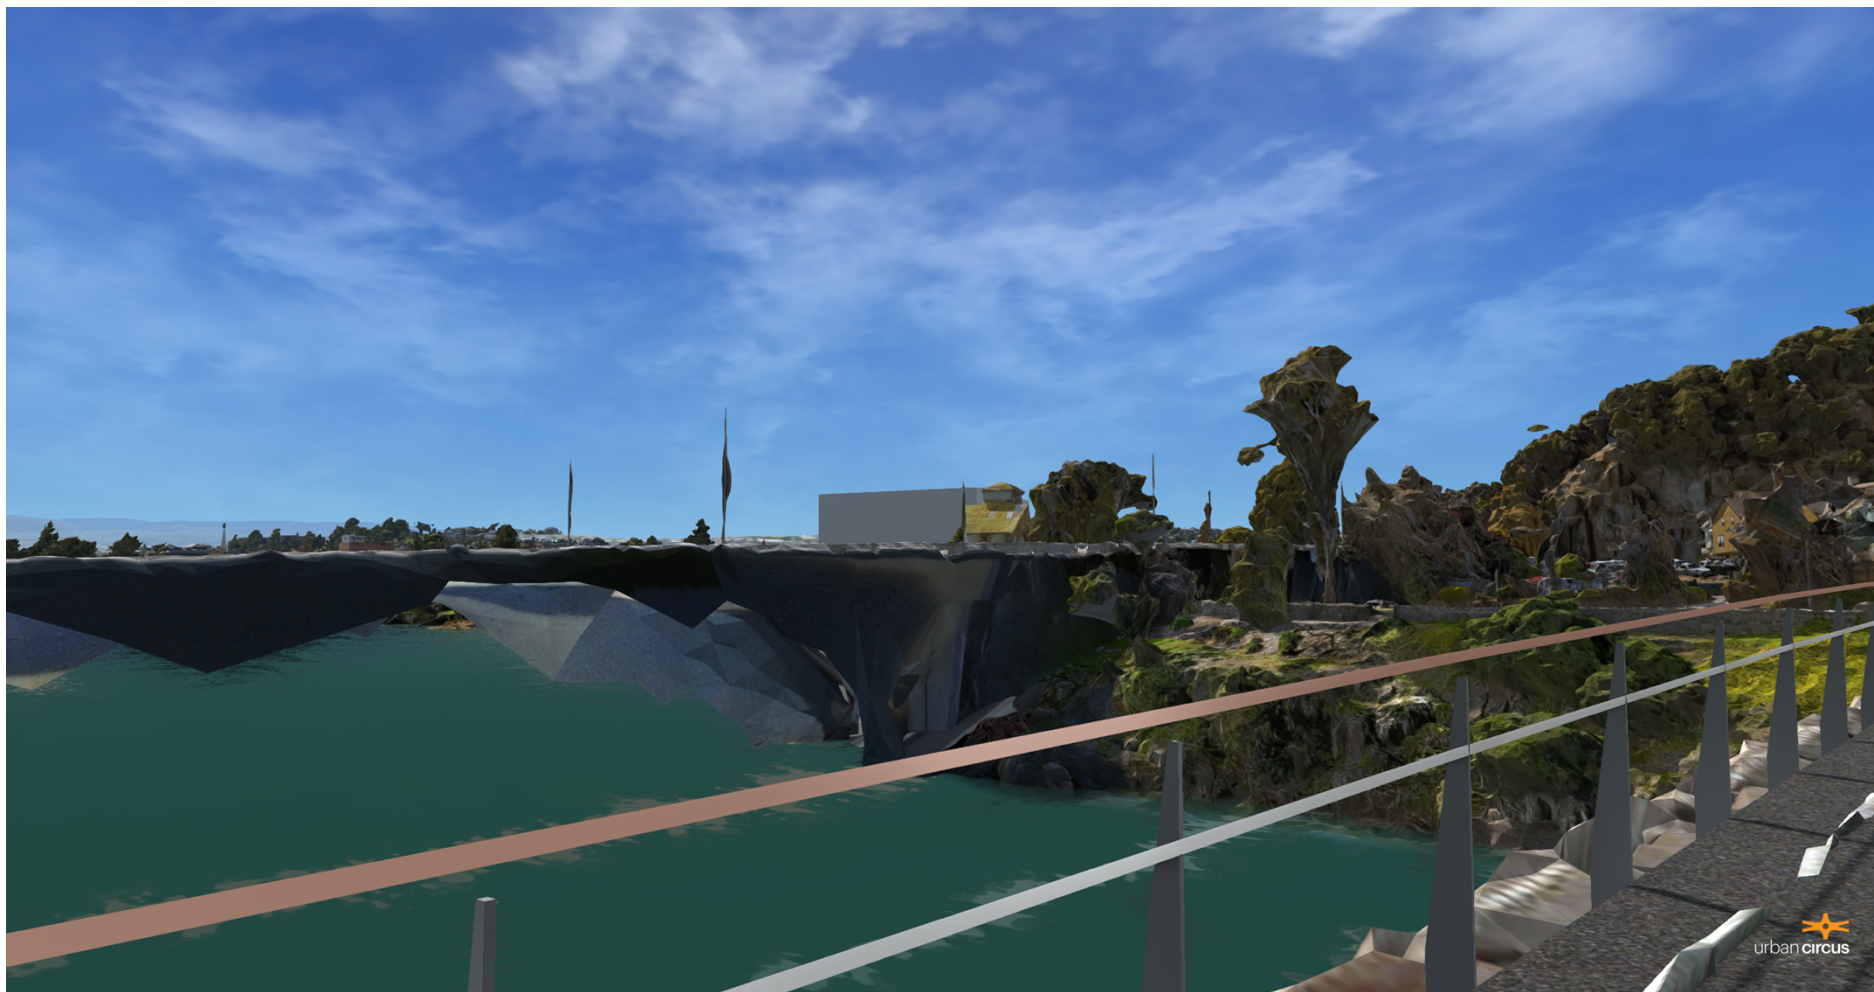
Viewpoint #1 - Kings Bridge (including building envelope)
